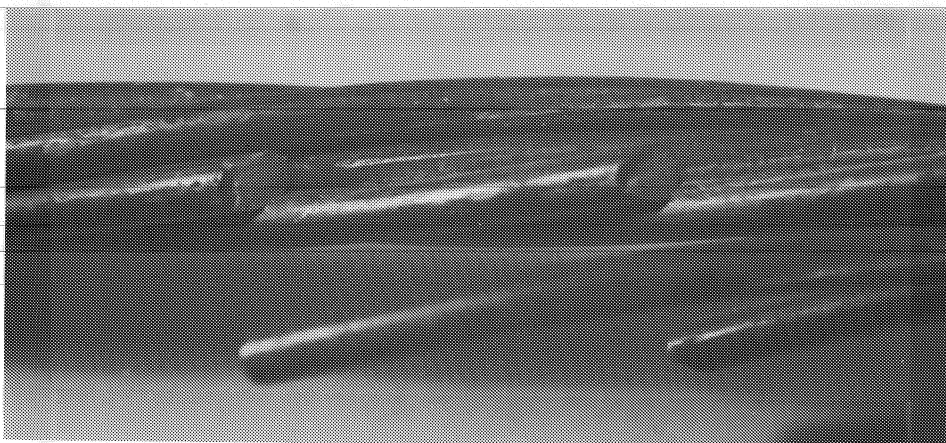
Fretting Fractures of Wires of a Group DM Specimen
